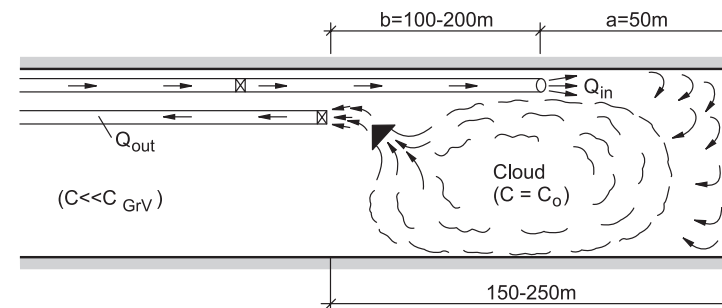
35. Two-way ventilation using two ducts.
